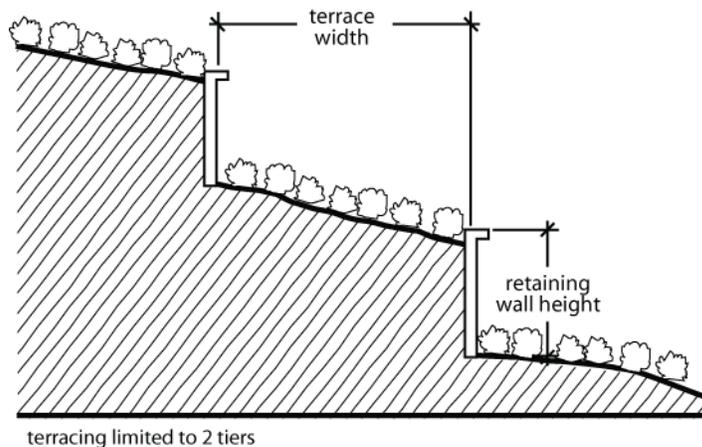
Natural Resource Protection, Hillside Protection, Retaining Walls
